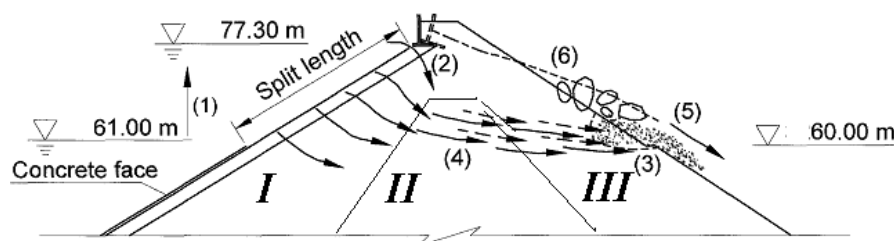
The Gouhou dam failure. Cross section and failure mechanism.
